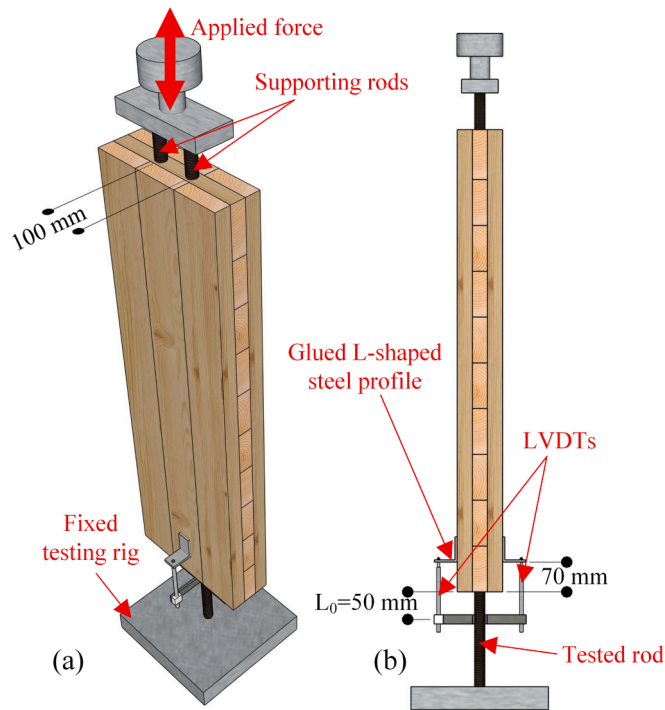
Pull-pull loading (a) 3D view, (b) side view.
